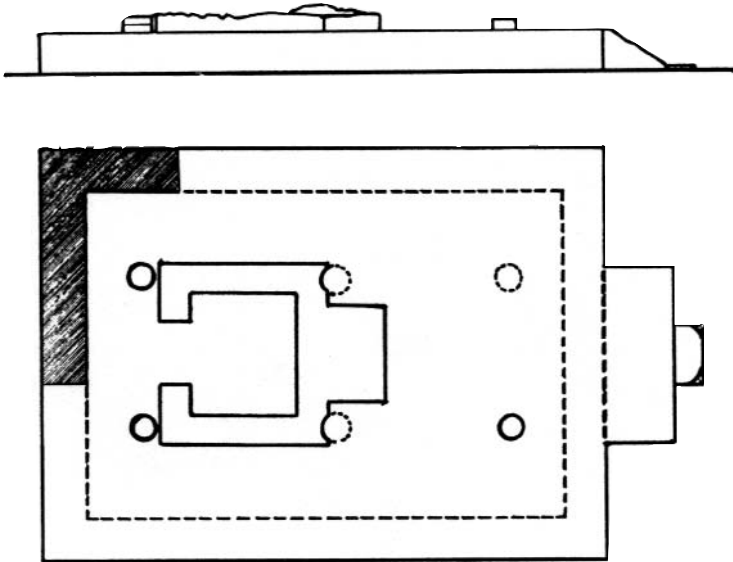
Shrine 25 at Muang Si Mahosot, elevation and plan.
